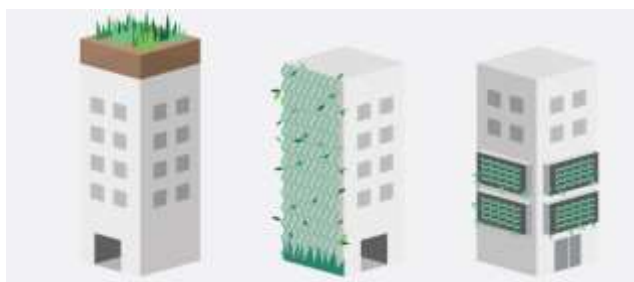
Vegetation can be added to a building as a green roof, green wall or green facade (Sidonie, 2014).
